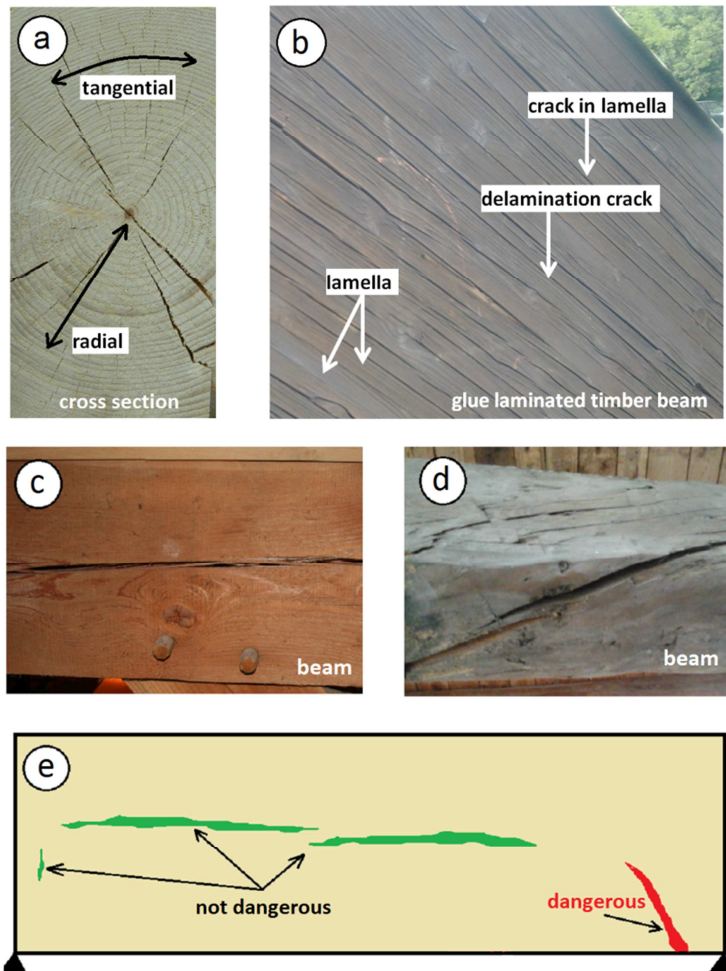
(a) Cross section of a timber beam with cracks in radial direction. (b) Glue laminated timber beam (side view) with cracks in the lamella and in the glue line (delamination cracks). (c) Example of an almost straight and continuous drying crack (d) Example of a serious crack crossing almost the entire- cross section. (e) Sketch of not dangerous and dangerous cracks, the green cracks generally are less dangerous than the red one, but it depends on the beam loading and remaining functional cross section.
